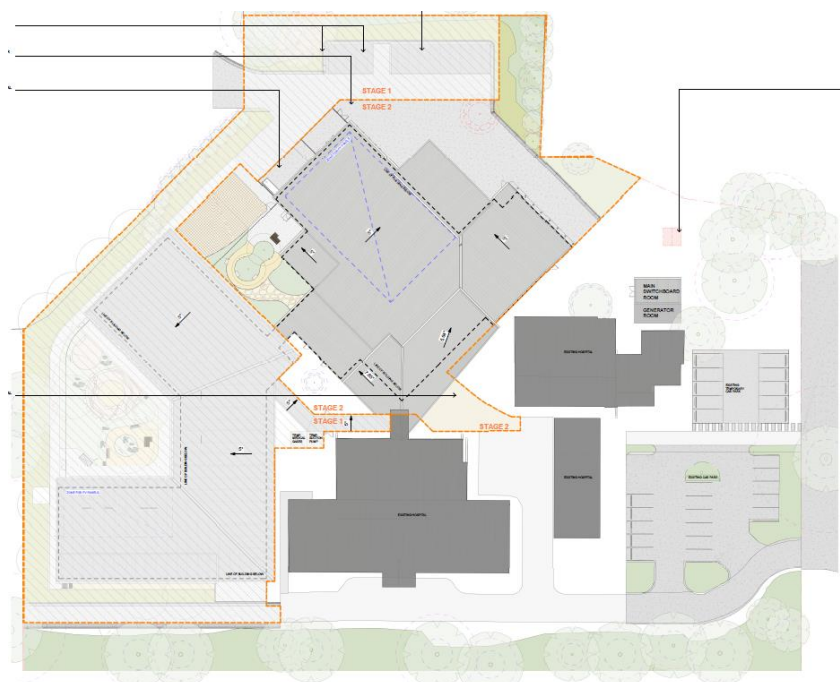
Stage 2 – Demolition of Existing RAC and Staff Areas. Construction of new HealthOne, Emergency Department, Support Services and Front & Back of House areas.
